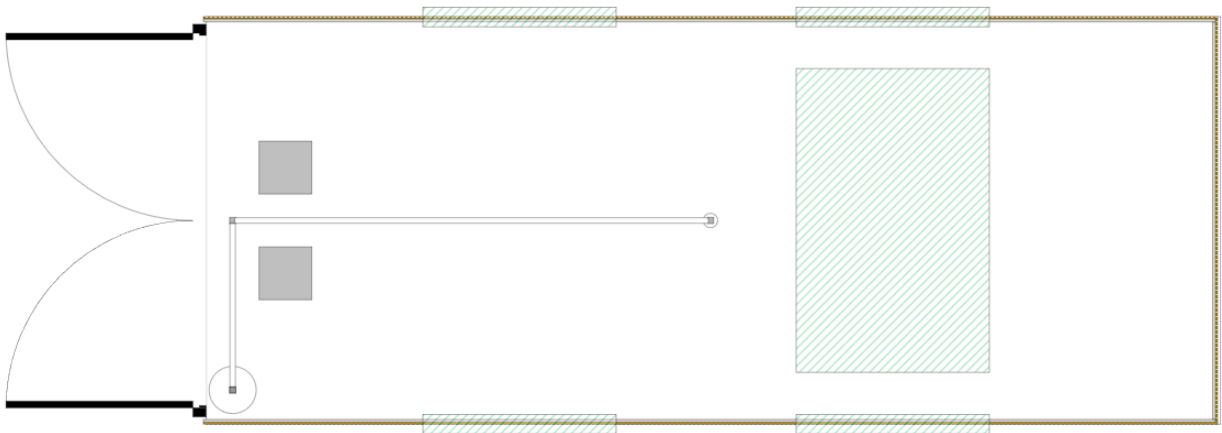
Clean agent piping system to a central discharge nozzle, plan view.
